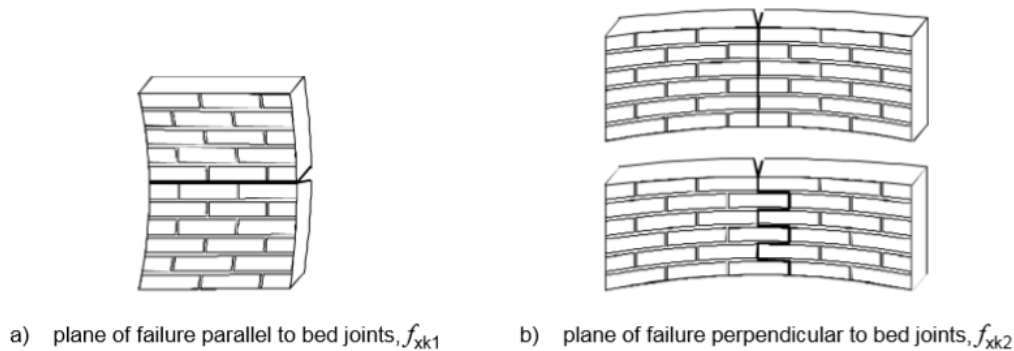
Planes of failure of masonry in bending (NEN-EN 1996-1-1+A1)
